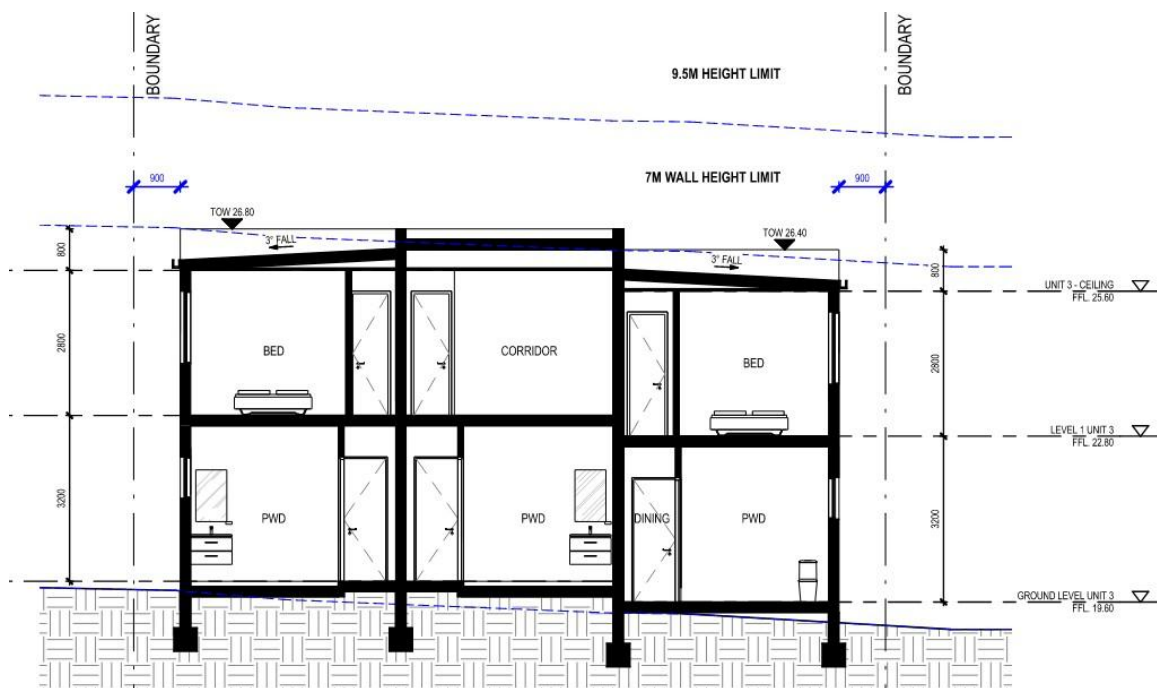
Cross-section of No.6-6B Chester Avenue (Source: DA/64/2023)
